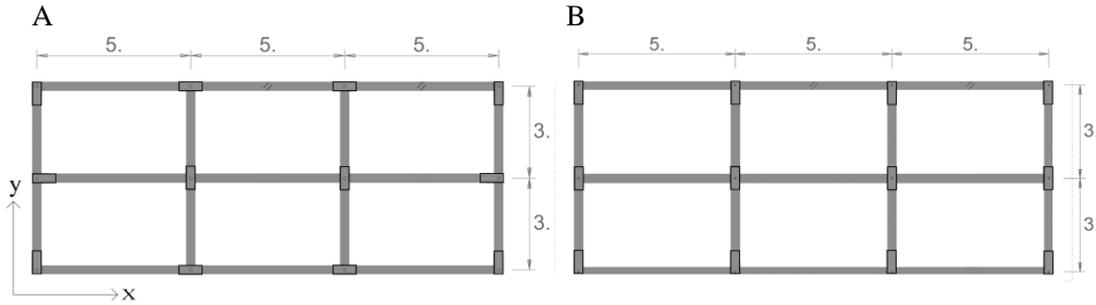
Floor plans of the analyzed structures identified by letters A and B
